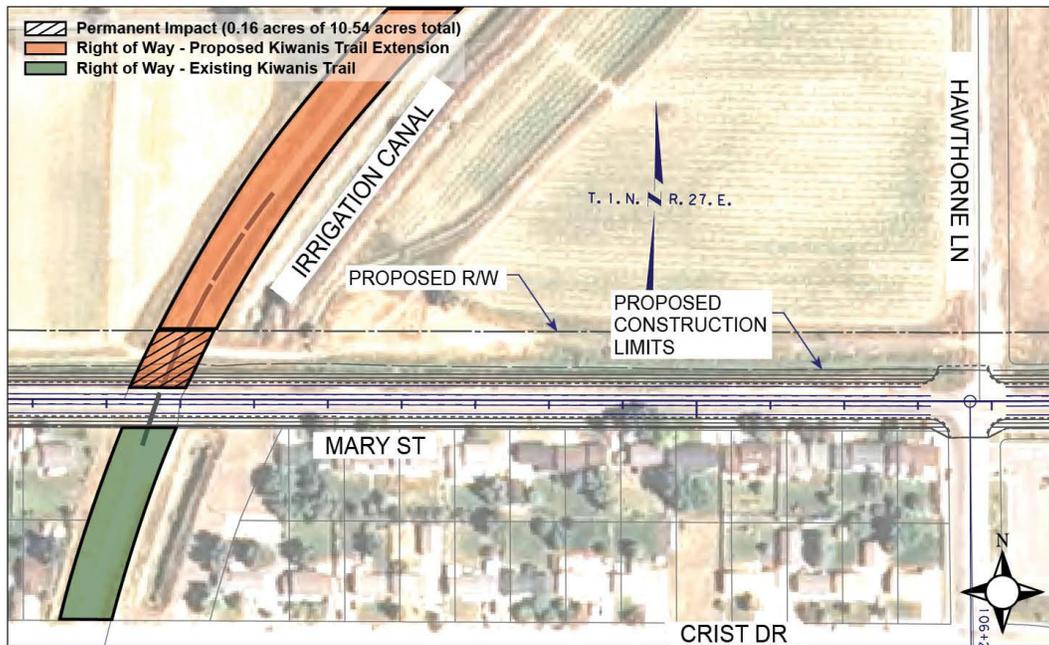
Project Footprints and the Existing and Planned Kiwanis Trails
